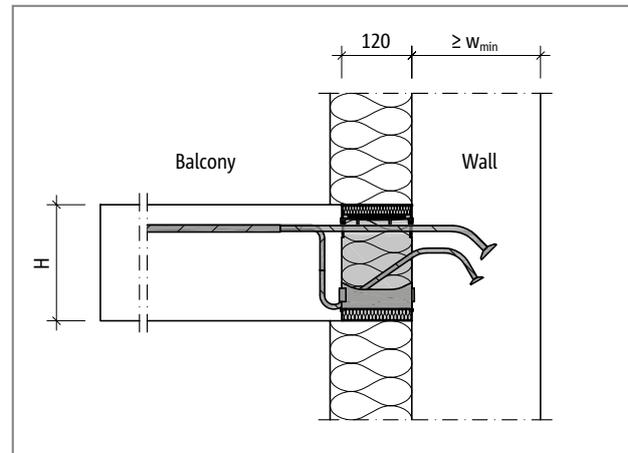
Schöck Isokorb® XT type K-O: Wall connection downwards with external insulation
